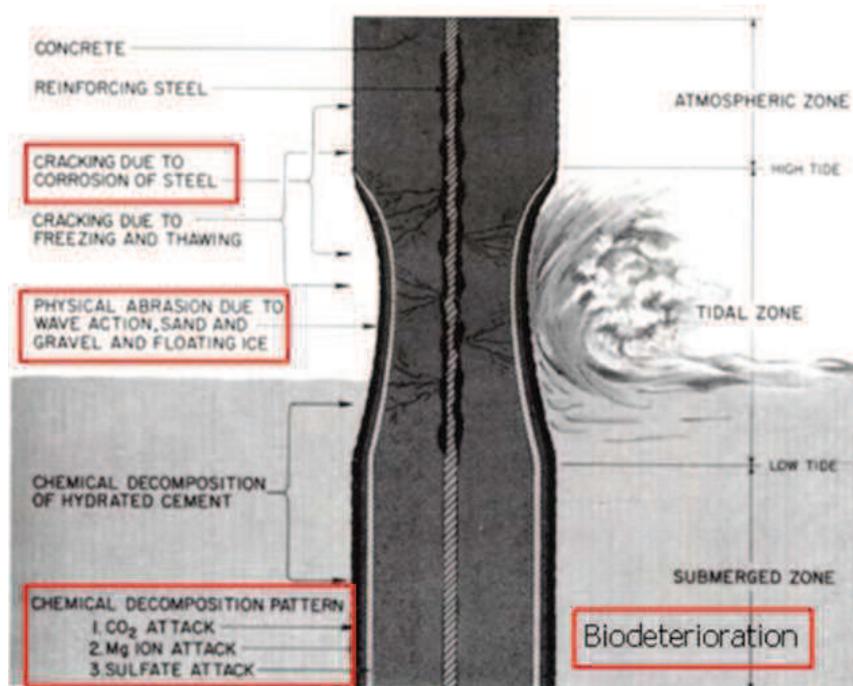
“ Typical degradation mechanisms in coastal concrete piling” [39]
